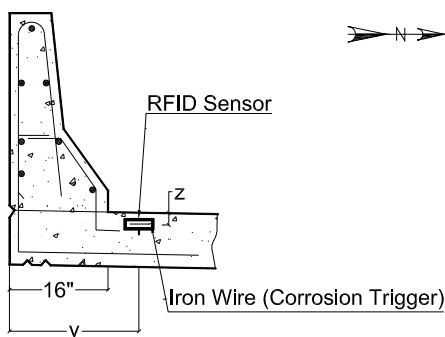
Bridge A7957 RFID Corrosion Sensors Installation (Elevation)
